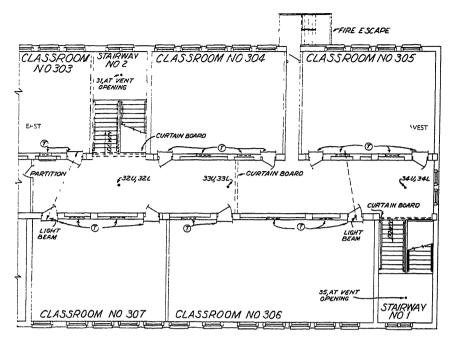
Cont. Floor plan of third floor showing location of thermocouples, curtain boards and light beams from photoelectric cells.
